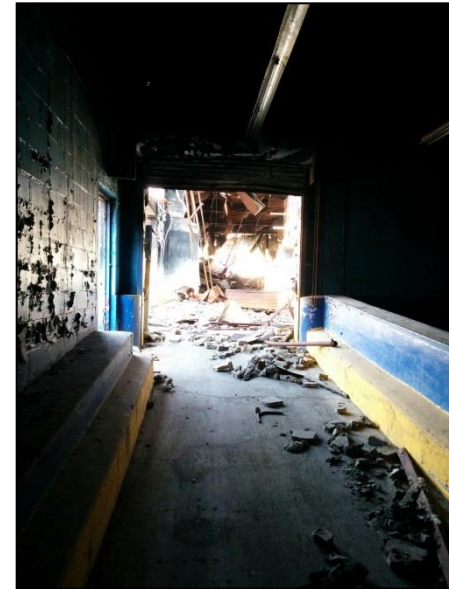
Former receiving area on the western portion of the Site, facing southwest.
